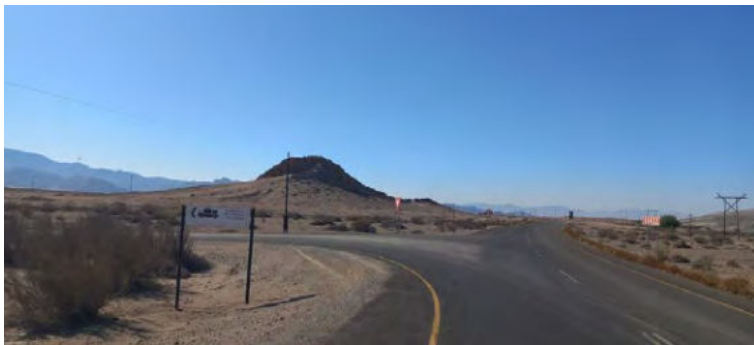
View of sign indicating access of the Main Road to the Site. Sign is visible and in good condition.
